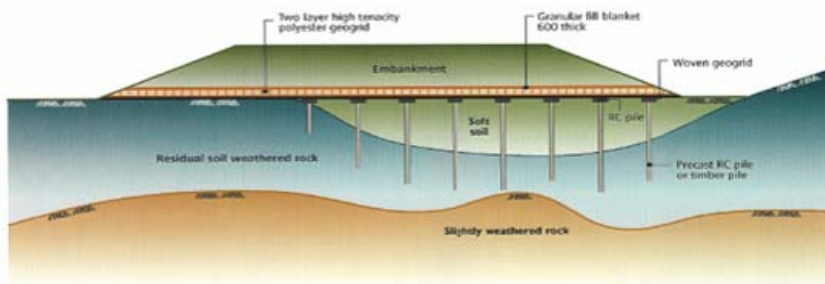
Piled embankment layout showing use of geotextile to transfer embankment load to pile caps.
